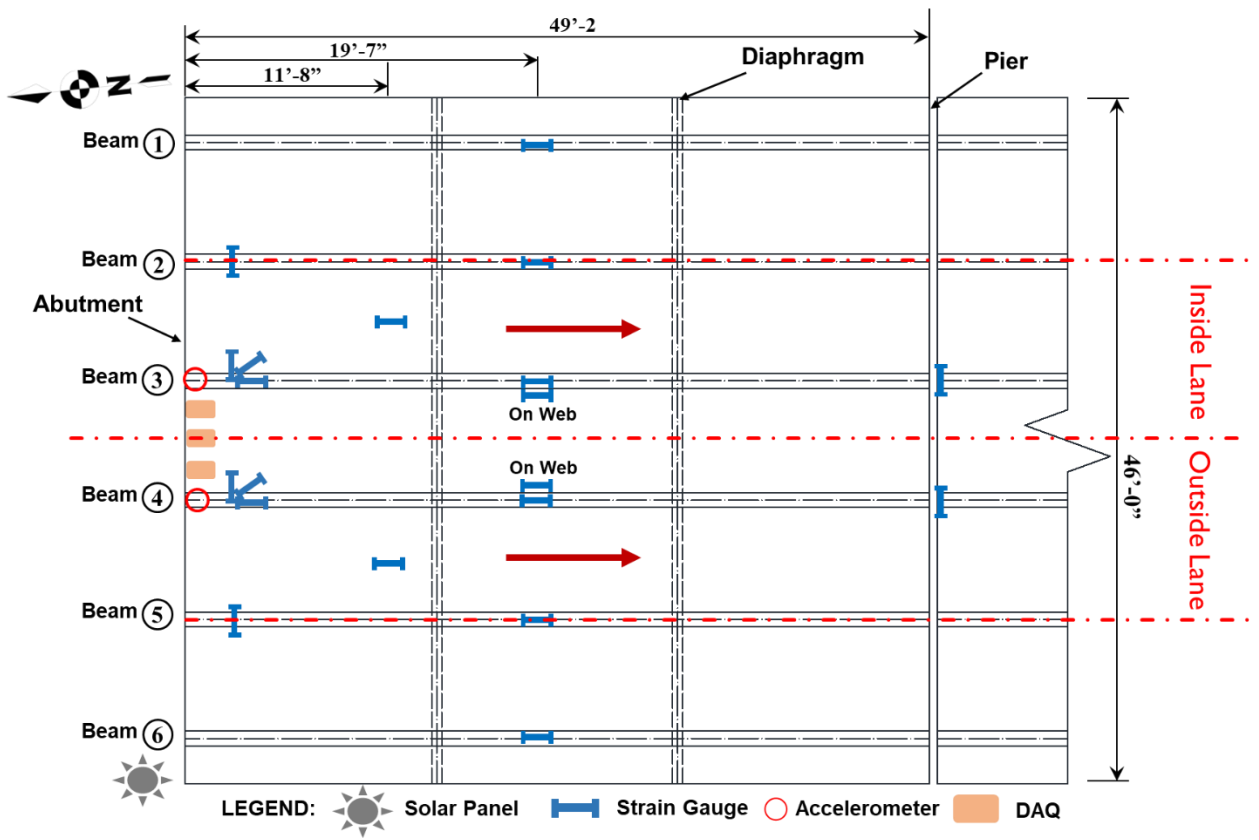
Sensor Layout for Bridge #3 (Plan View).
